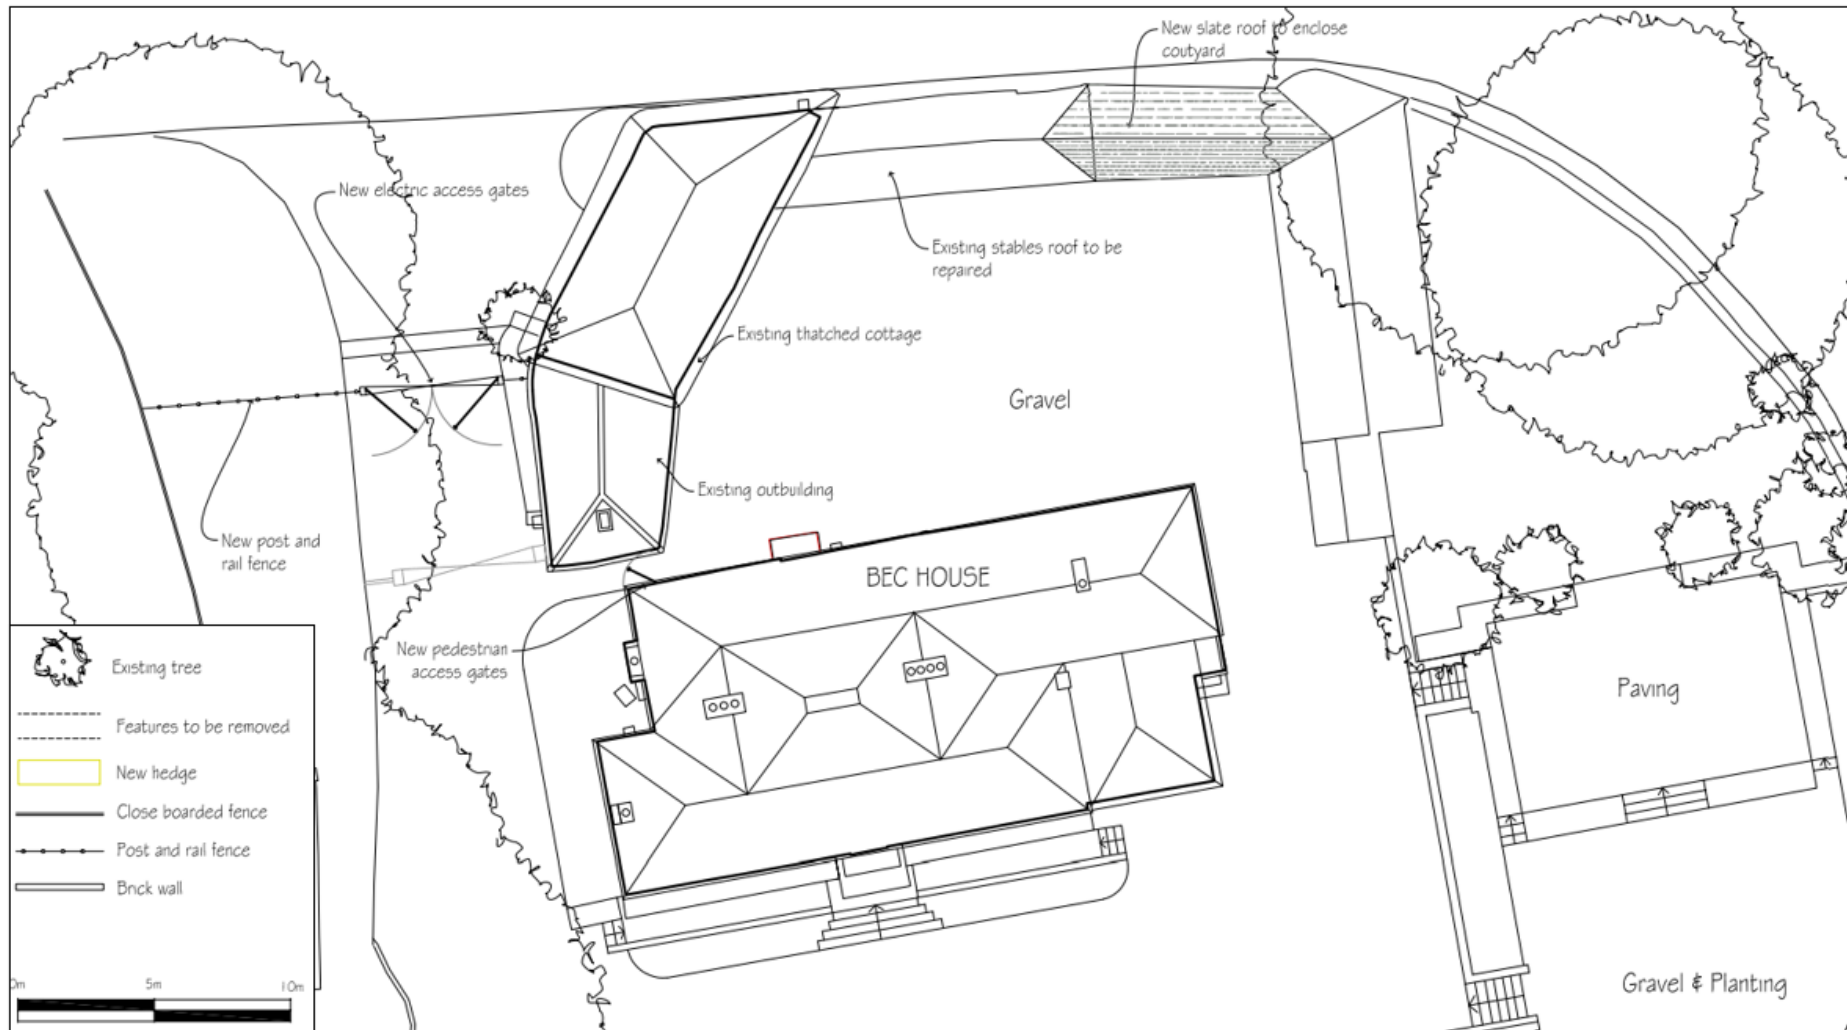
Site plan of Bec House and outbuildings, with proposed layout (Fowler Architecture and Planning).
